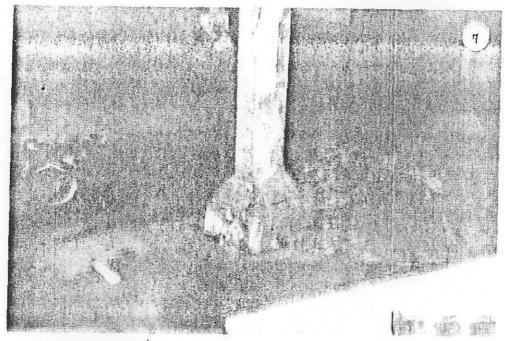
Steel Column and Concrete Base With Rust & Minor Corrosion.
